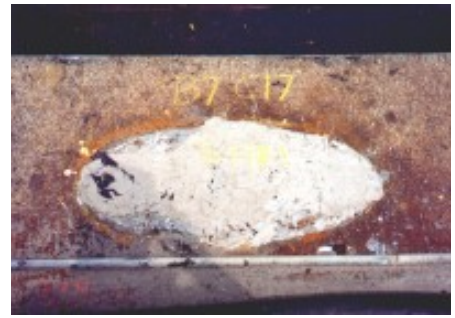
Berth 7, fitting B7-C17, Sta. 6+18.1, 26" cleat bolts are sheared off and cleat is missing, #4 rating
